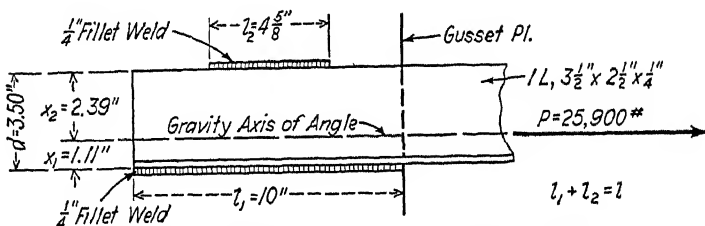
Fillet Welded Connection of Single Angle.
